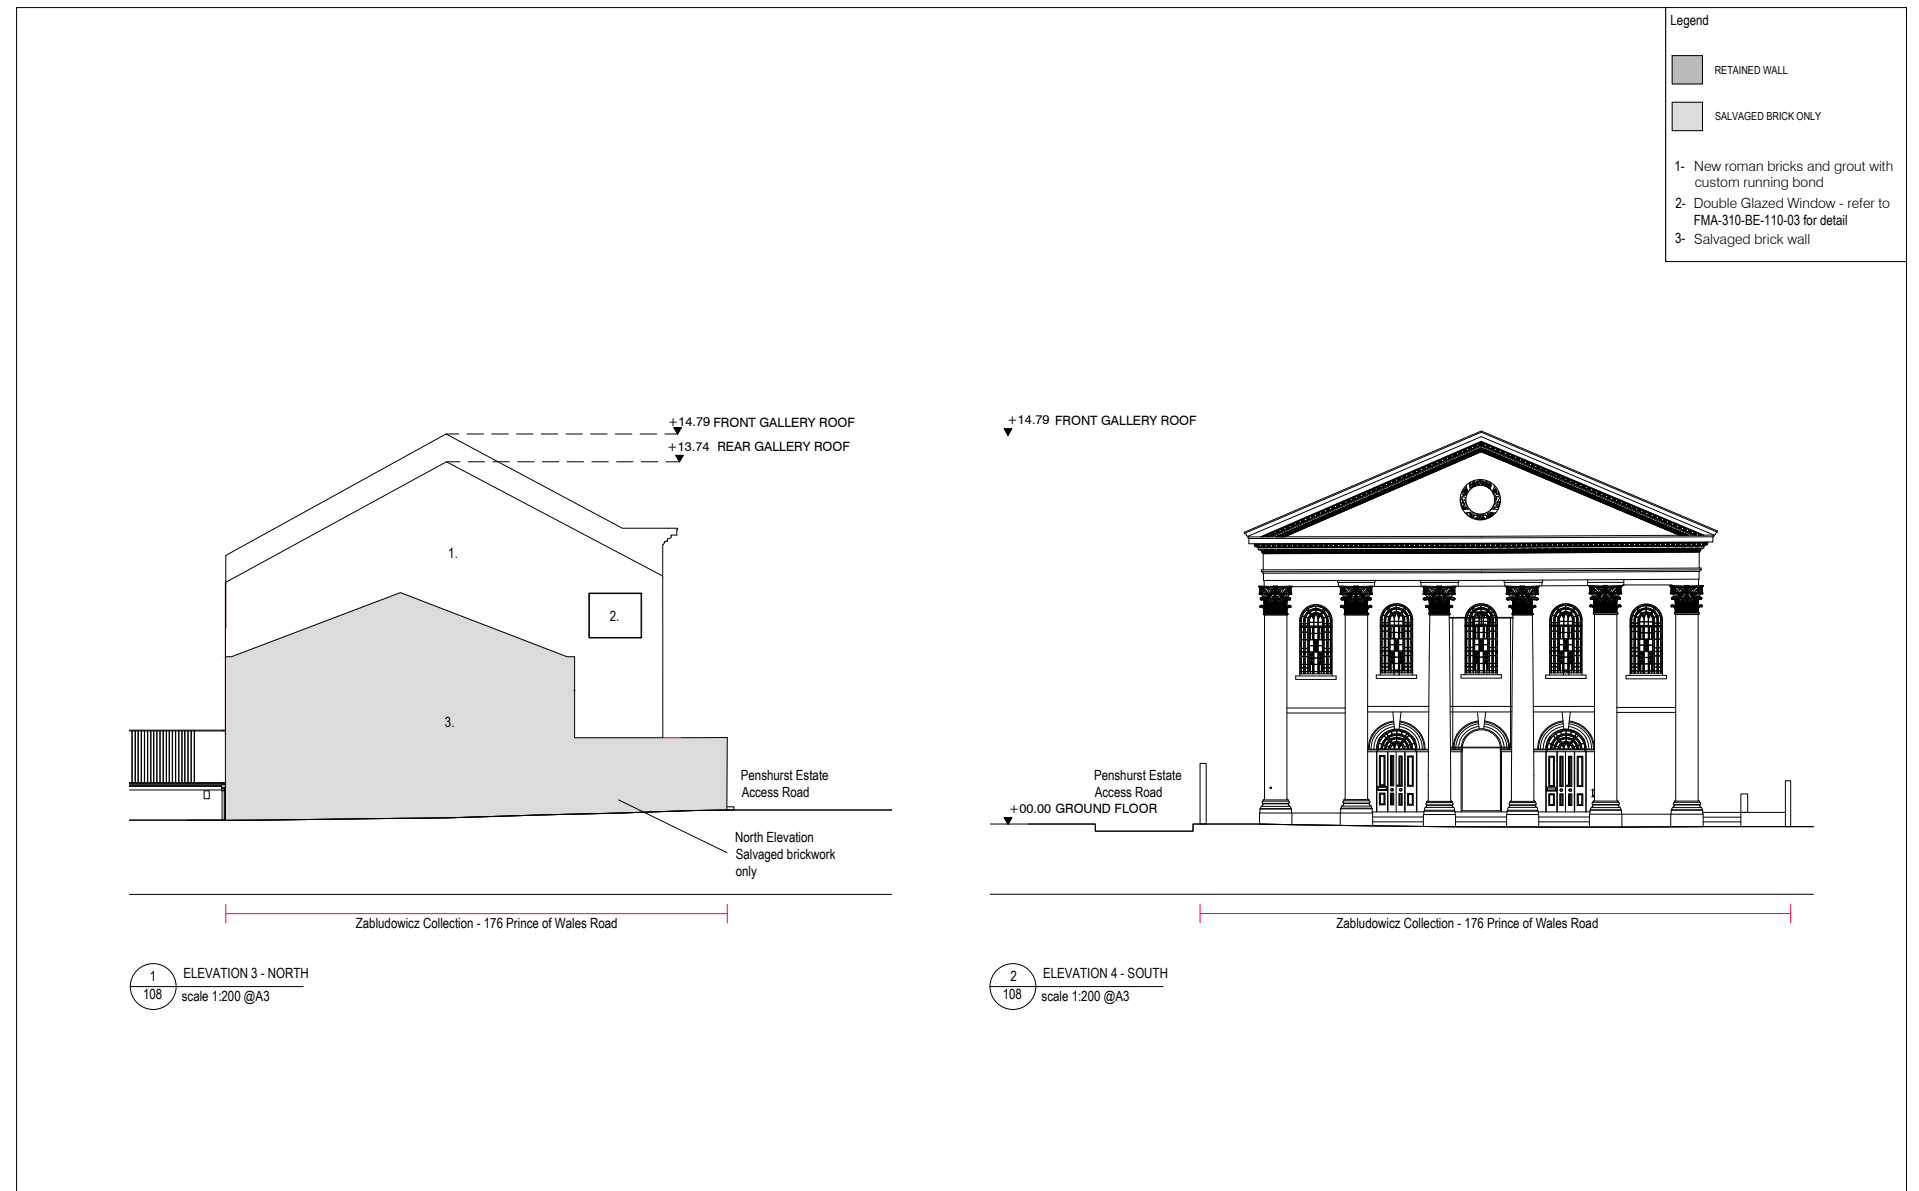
Proposed North and South elevations. Source: Farshid Moussavi Architecture.
